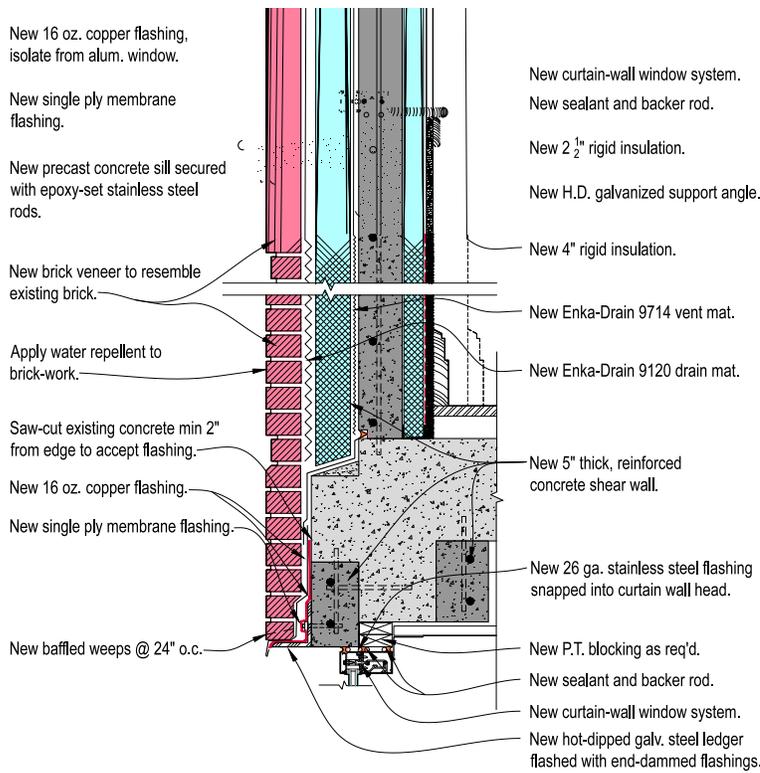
(11): Option 2 New Masonry Veneer Appr. at Typ. Stone-Sill Windows
